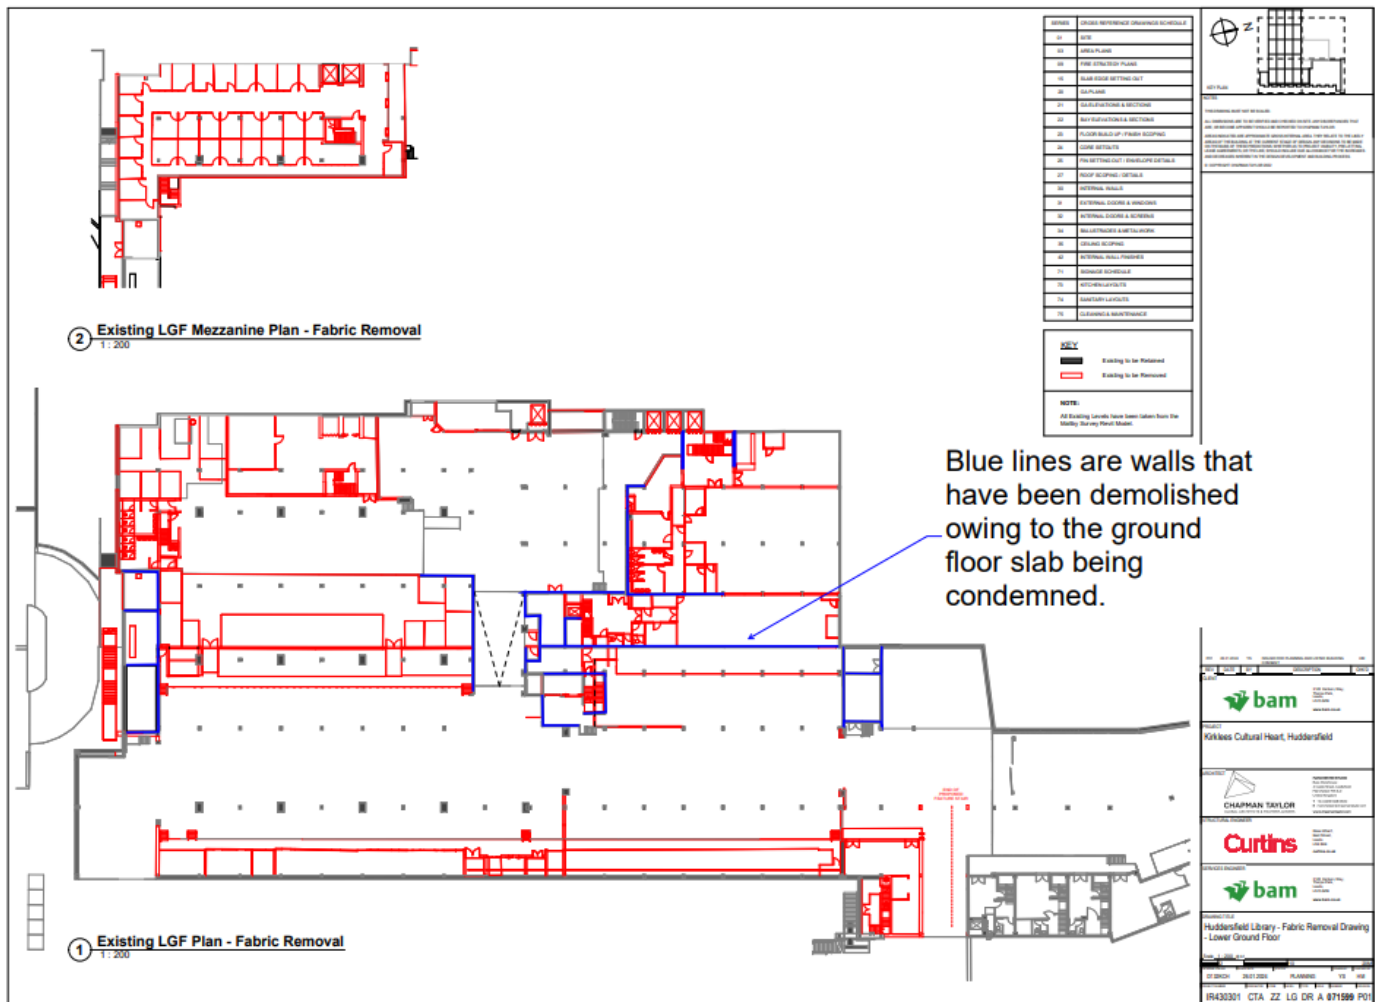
IR430301 CTA ZZ L DR 071599 P01 Proposed Lower Ground Floor Demolitions Plan
